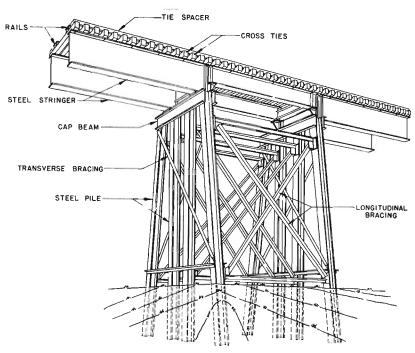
Railway bridge, steel stringers on braced steel pile bents.
